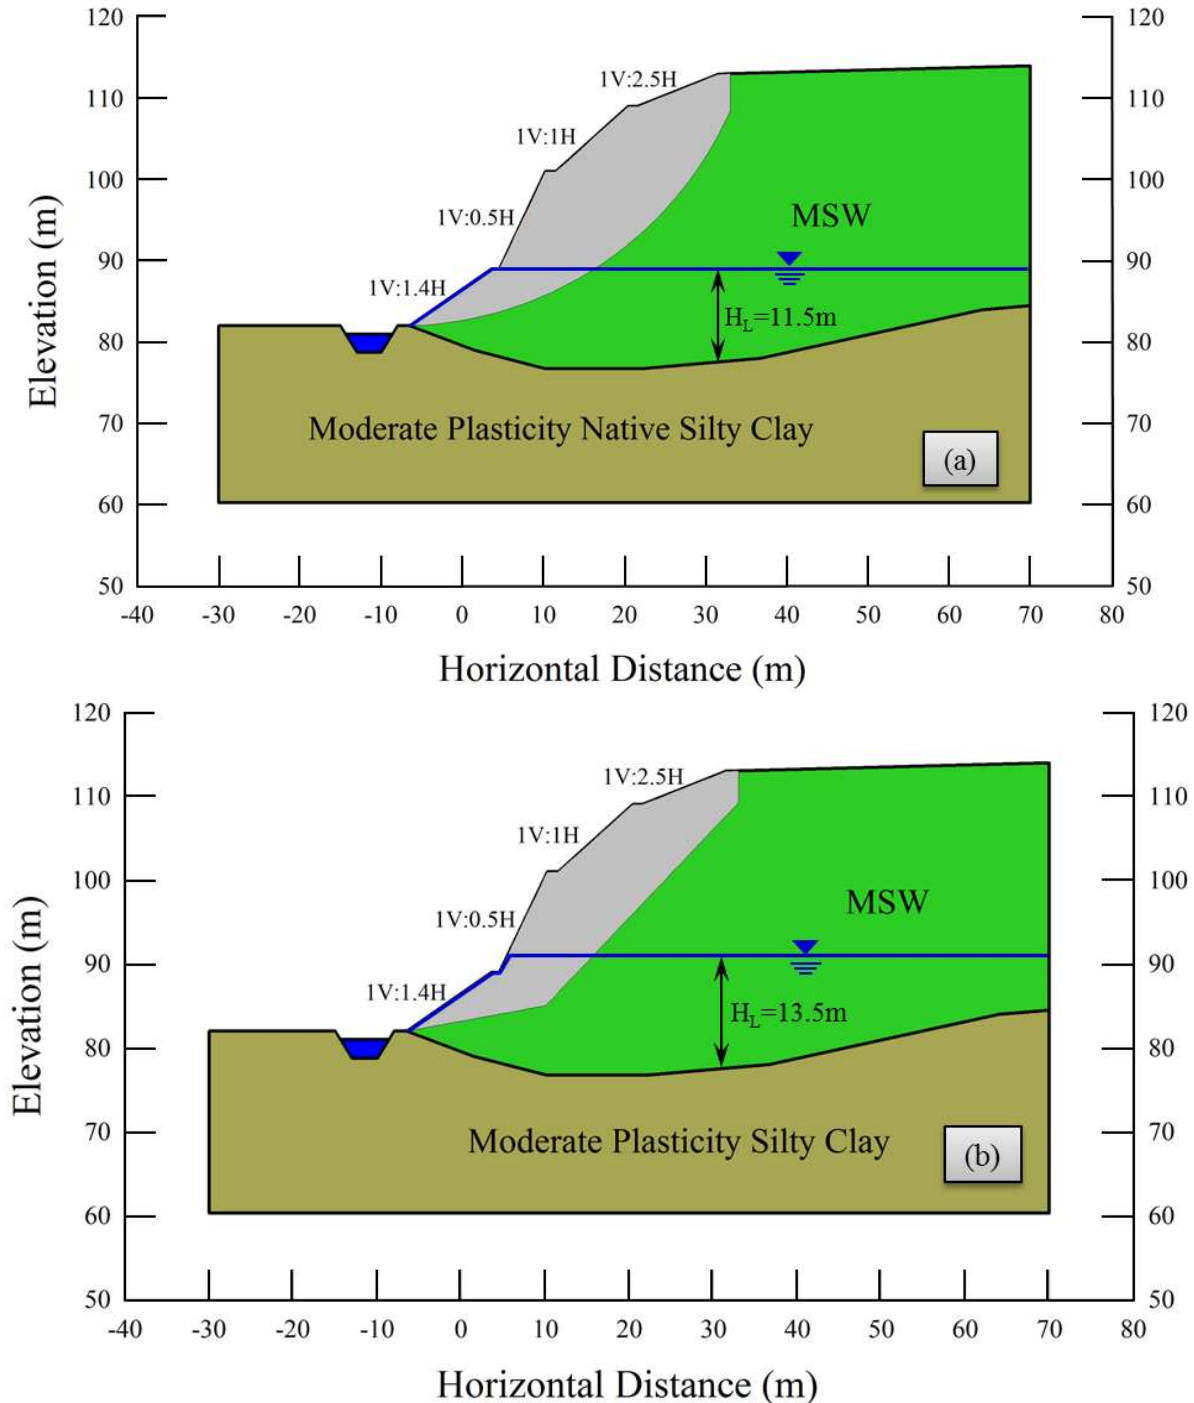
Cross- sections showing location of (a) circular and (b) planar failure surfaces.
